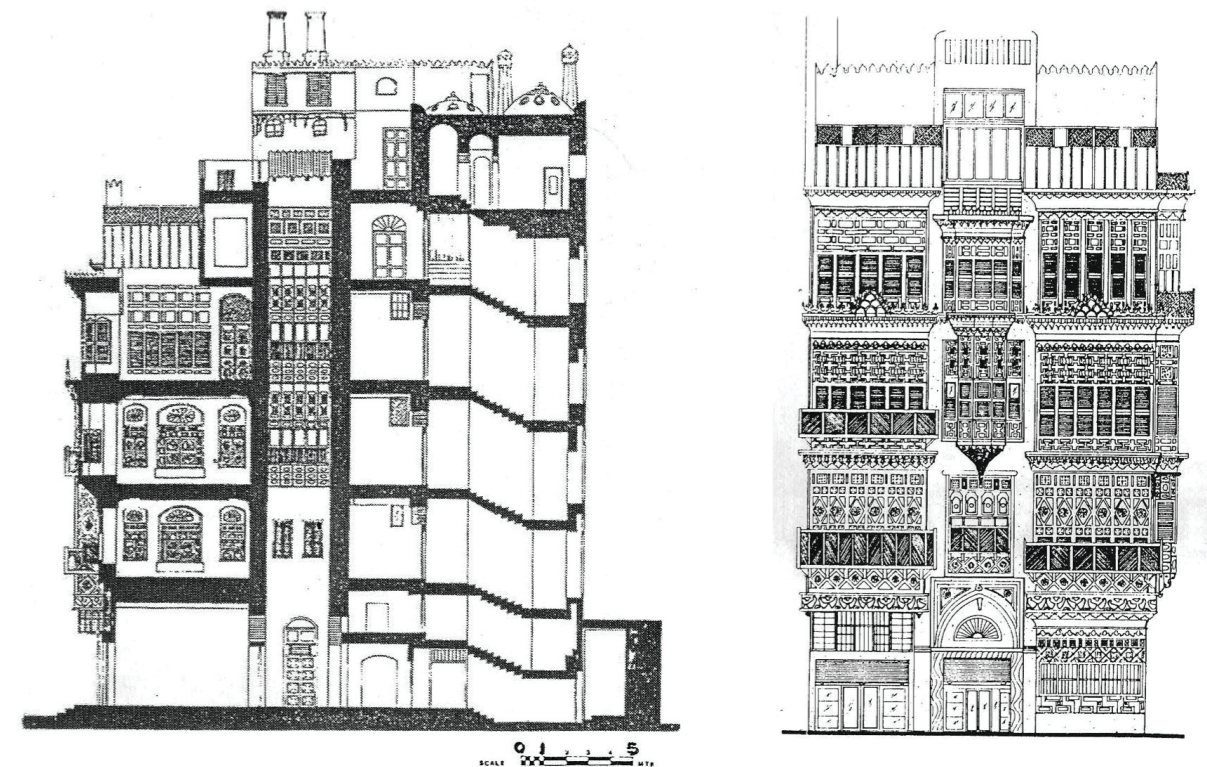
Section and Elevation of Noorwali House, which is one of the most prominent large houses in Old Jeddah.
